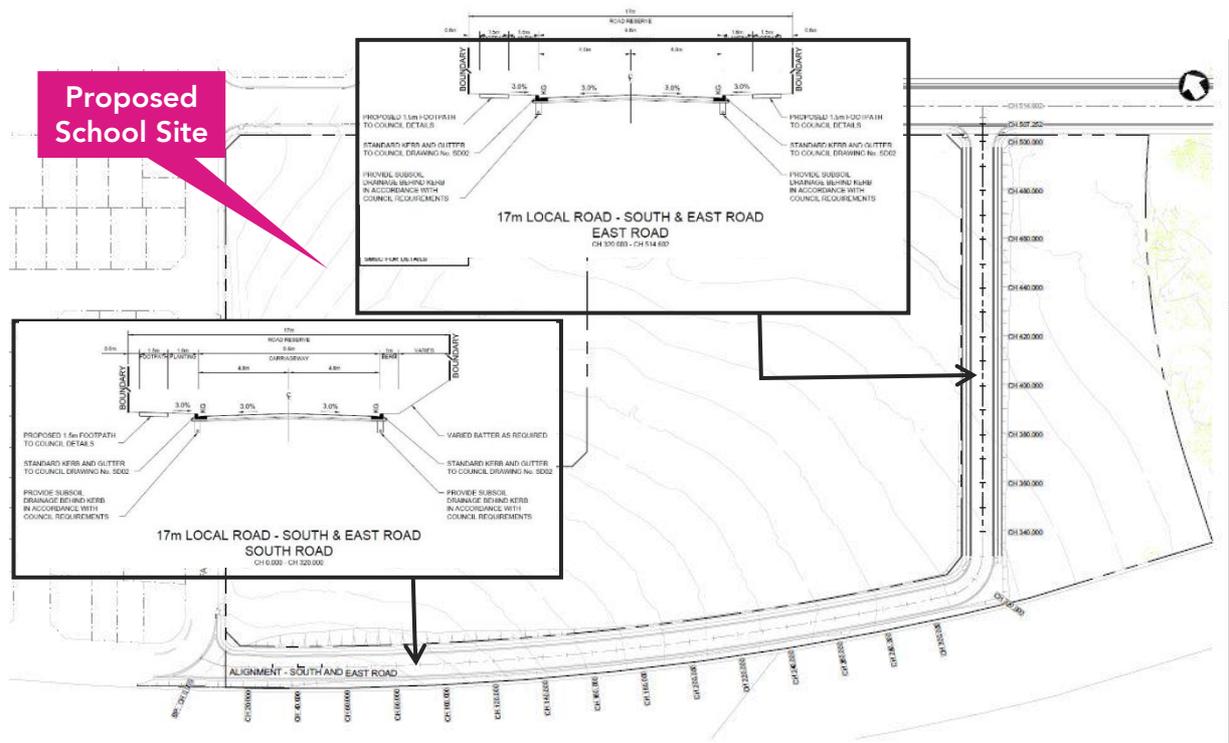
The South-East Road – Faulkner Way towards Parkway Avenue
